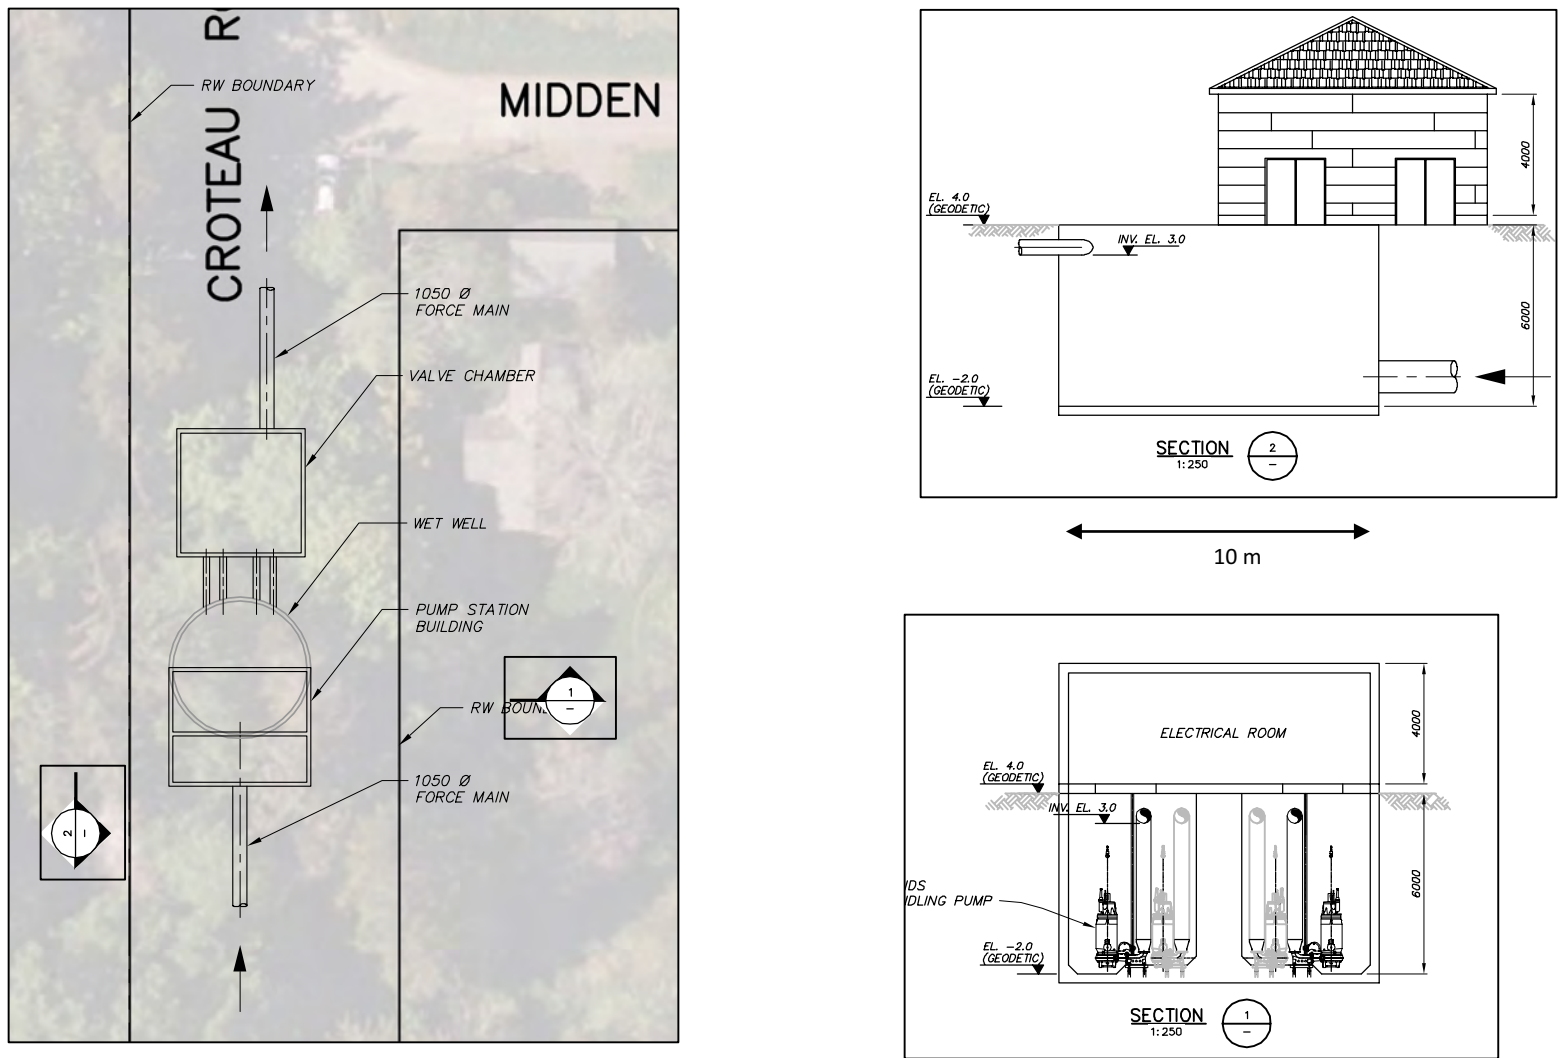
Comox No. 2 Pump Station - Plan and Conceptual Design (from Comox No. 2 Pump Station Siting Study technical memorandum AECOM, December 22, 2015)
